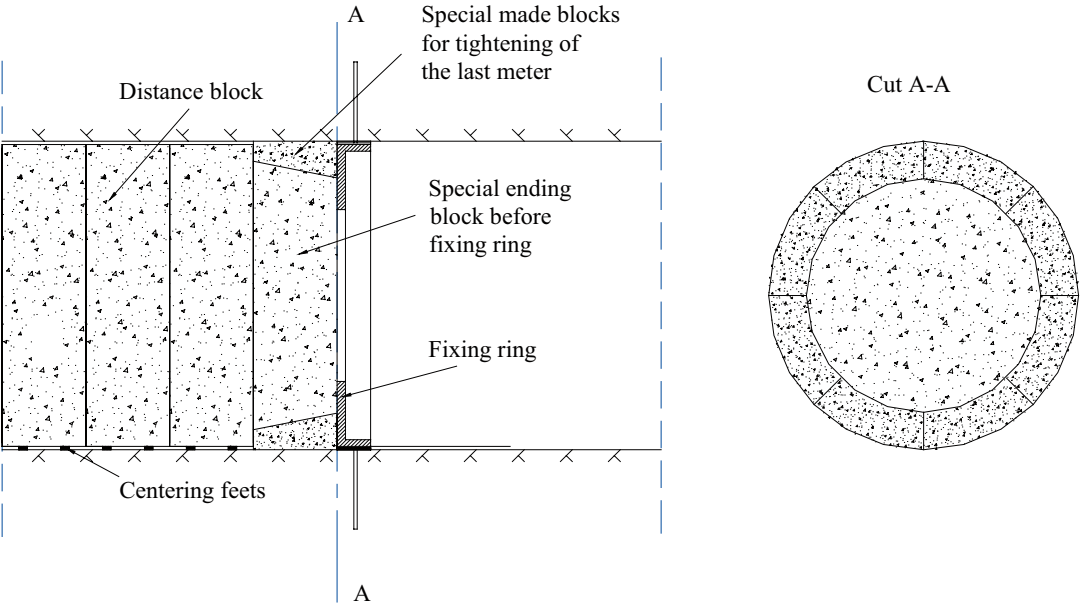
Figure showing a schematic drawing of Layout Alternative 4.
